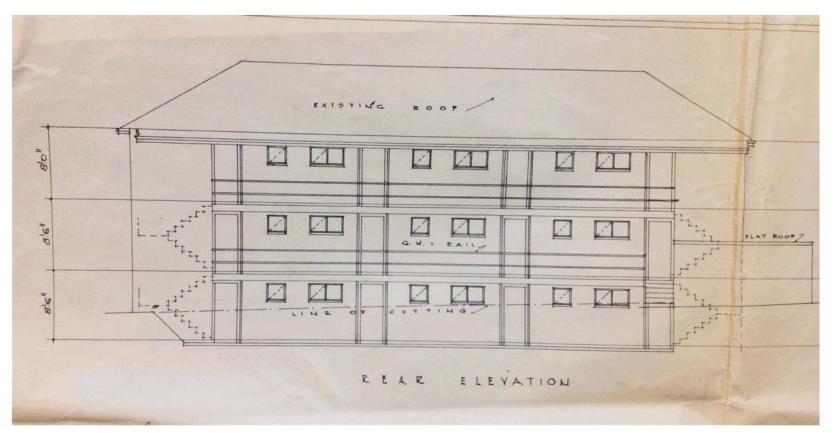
Proposed rear elevation of the Wilmot Terrace conversion. Note the marked 'line of cutting' indicating the excavation to achieve the basement conversion to the ground floor.
